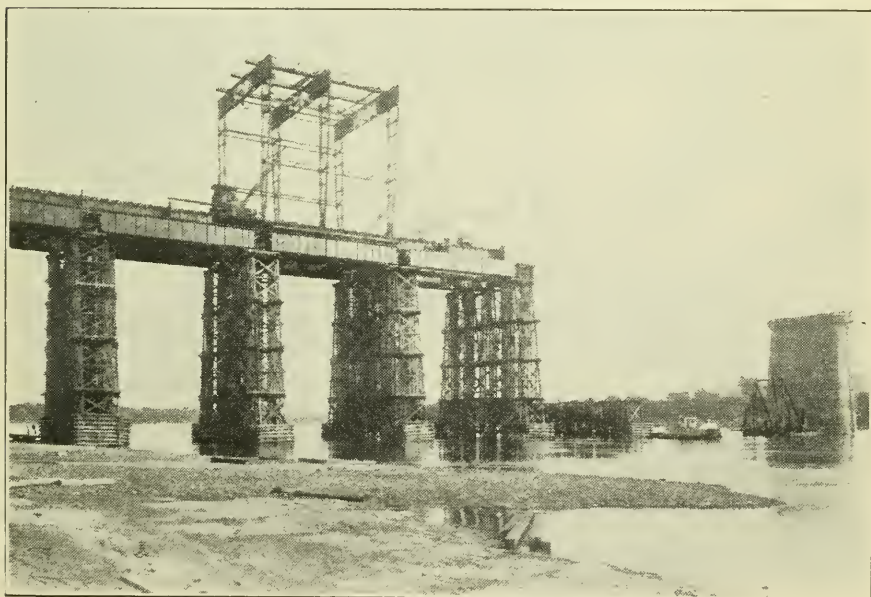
ERECTION OF FALSEWORK AND LAYING OF STEEL FLOOR SYSTEM AND TRACKS BY GANTRY TRAVELER, SCIOTOVILLE BRIDGE.
